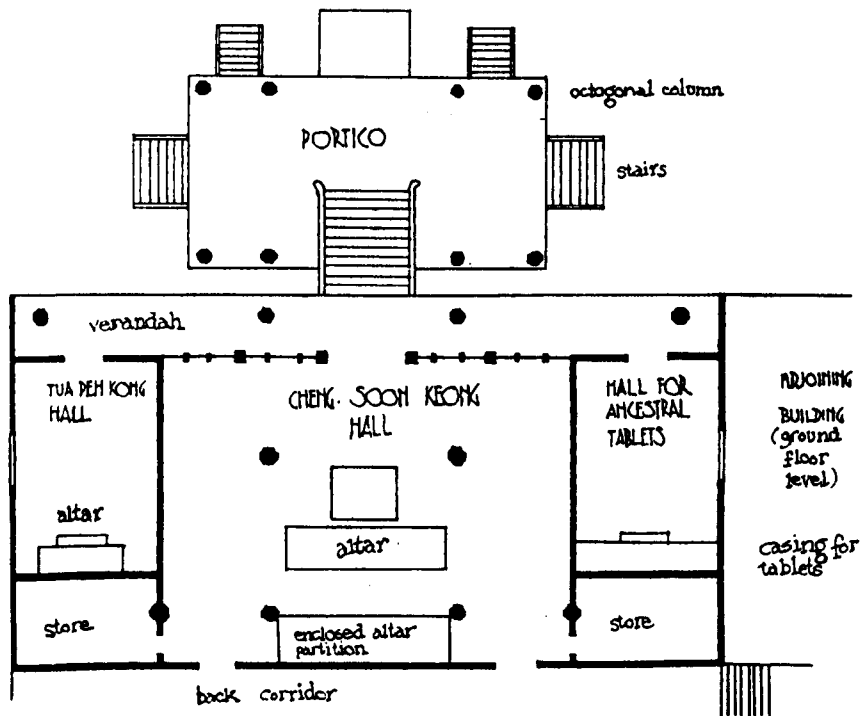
Floor plan of Khoo Kongsí in Penang.
